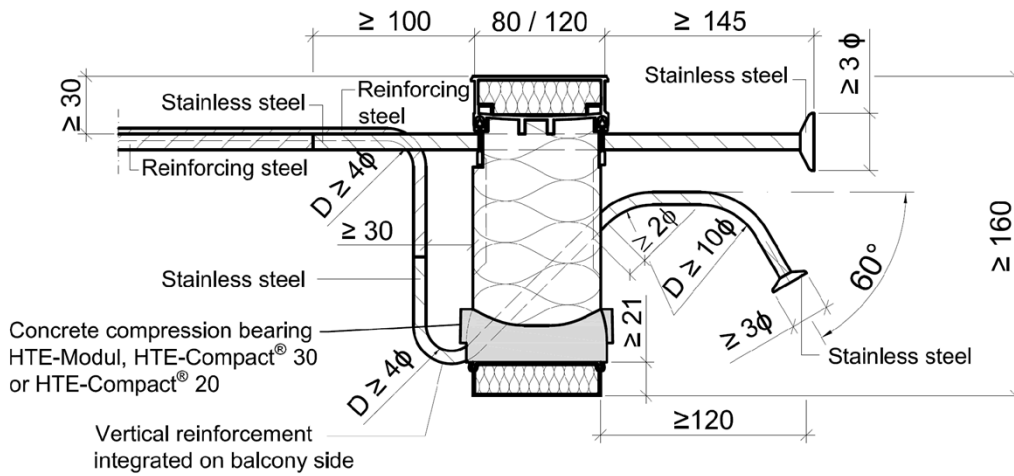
Example of Schöck Isokorb® Type K-U with CCE
